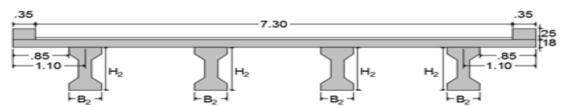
Diagram of the vehicular bridge deck supported on post-tensioned concrete beams.
